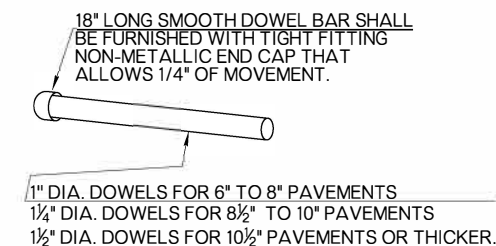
DETAIL OF DOWEL BAR AT CONSTRUCTION JOINT
